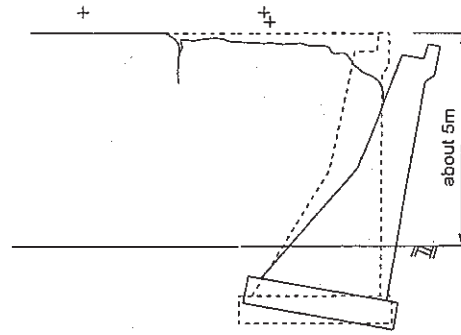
Typical damage to gravity-type unreinforced concrete RWs; embankment for Main Line of Hanshin Railway Co. adjacent to Ishiyagawa Station
